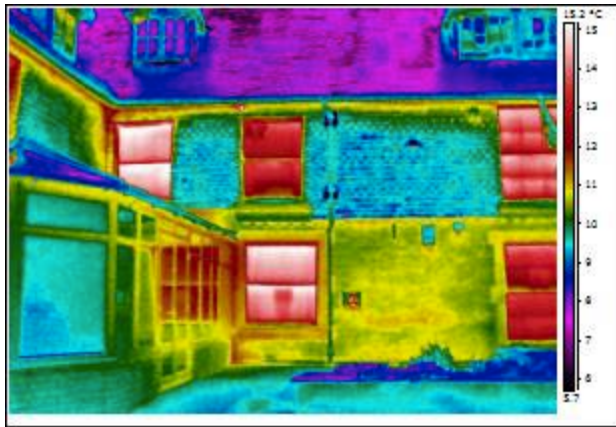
Back elevation (east). The image shows the heat loss through external wall at ground floor. It is likely to be due to poor insulation of external wall.
